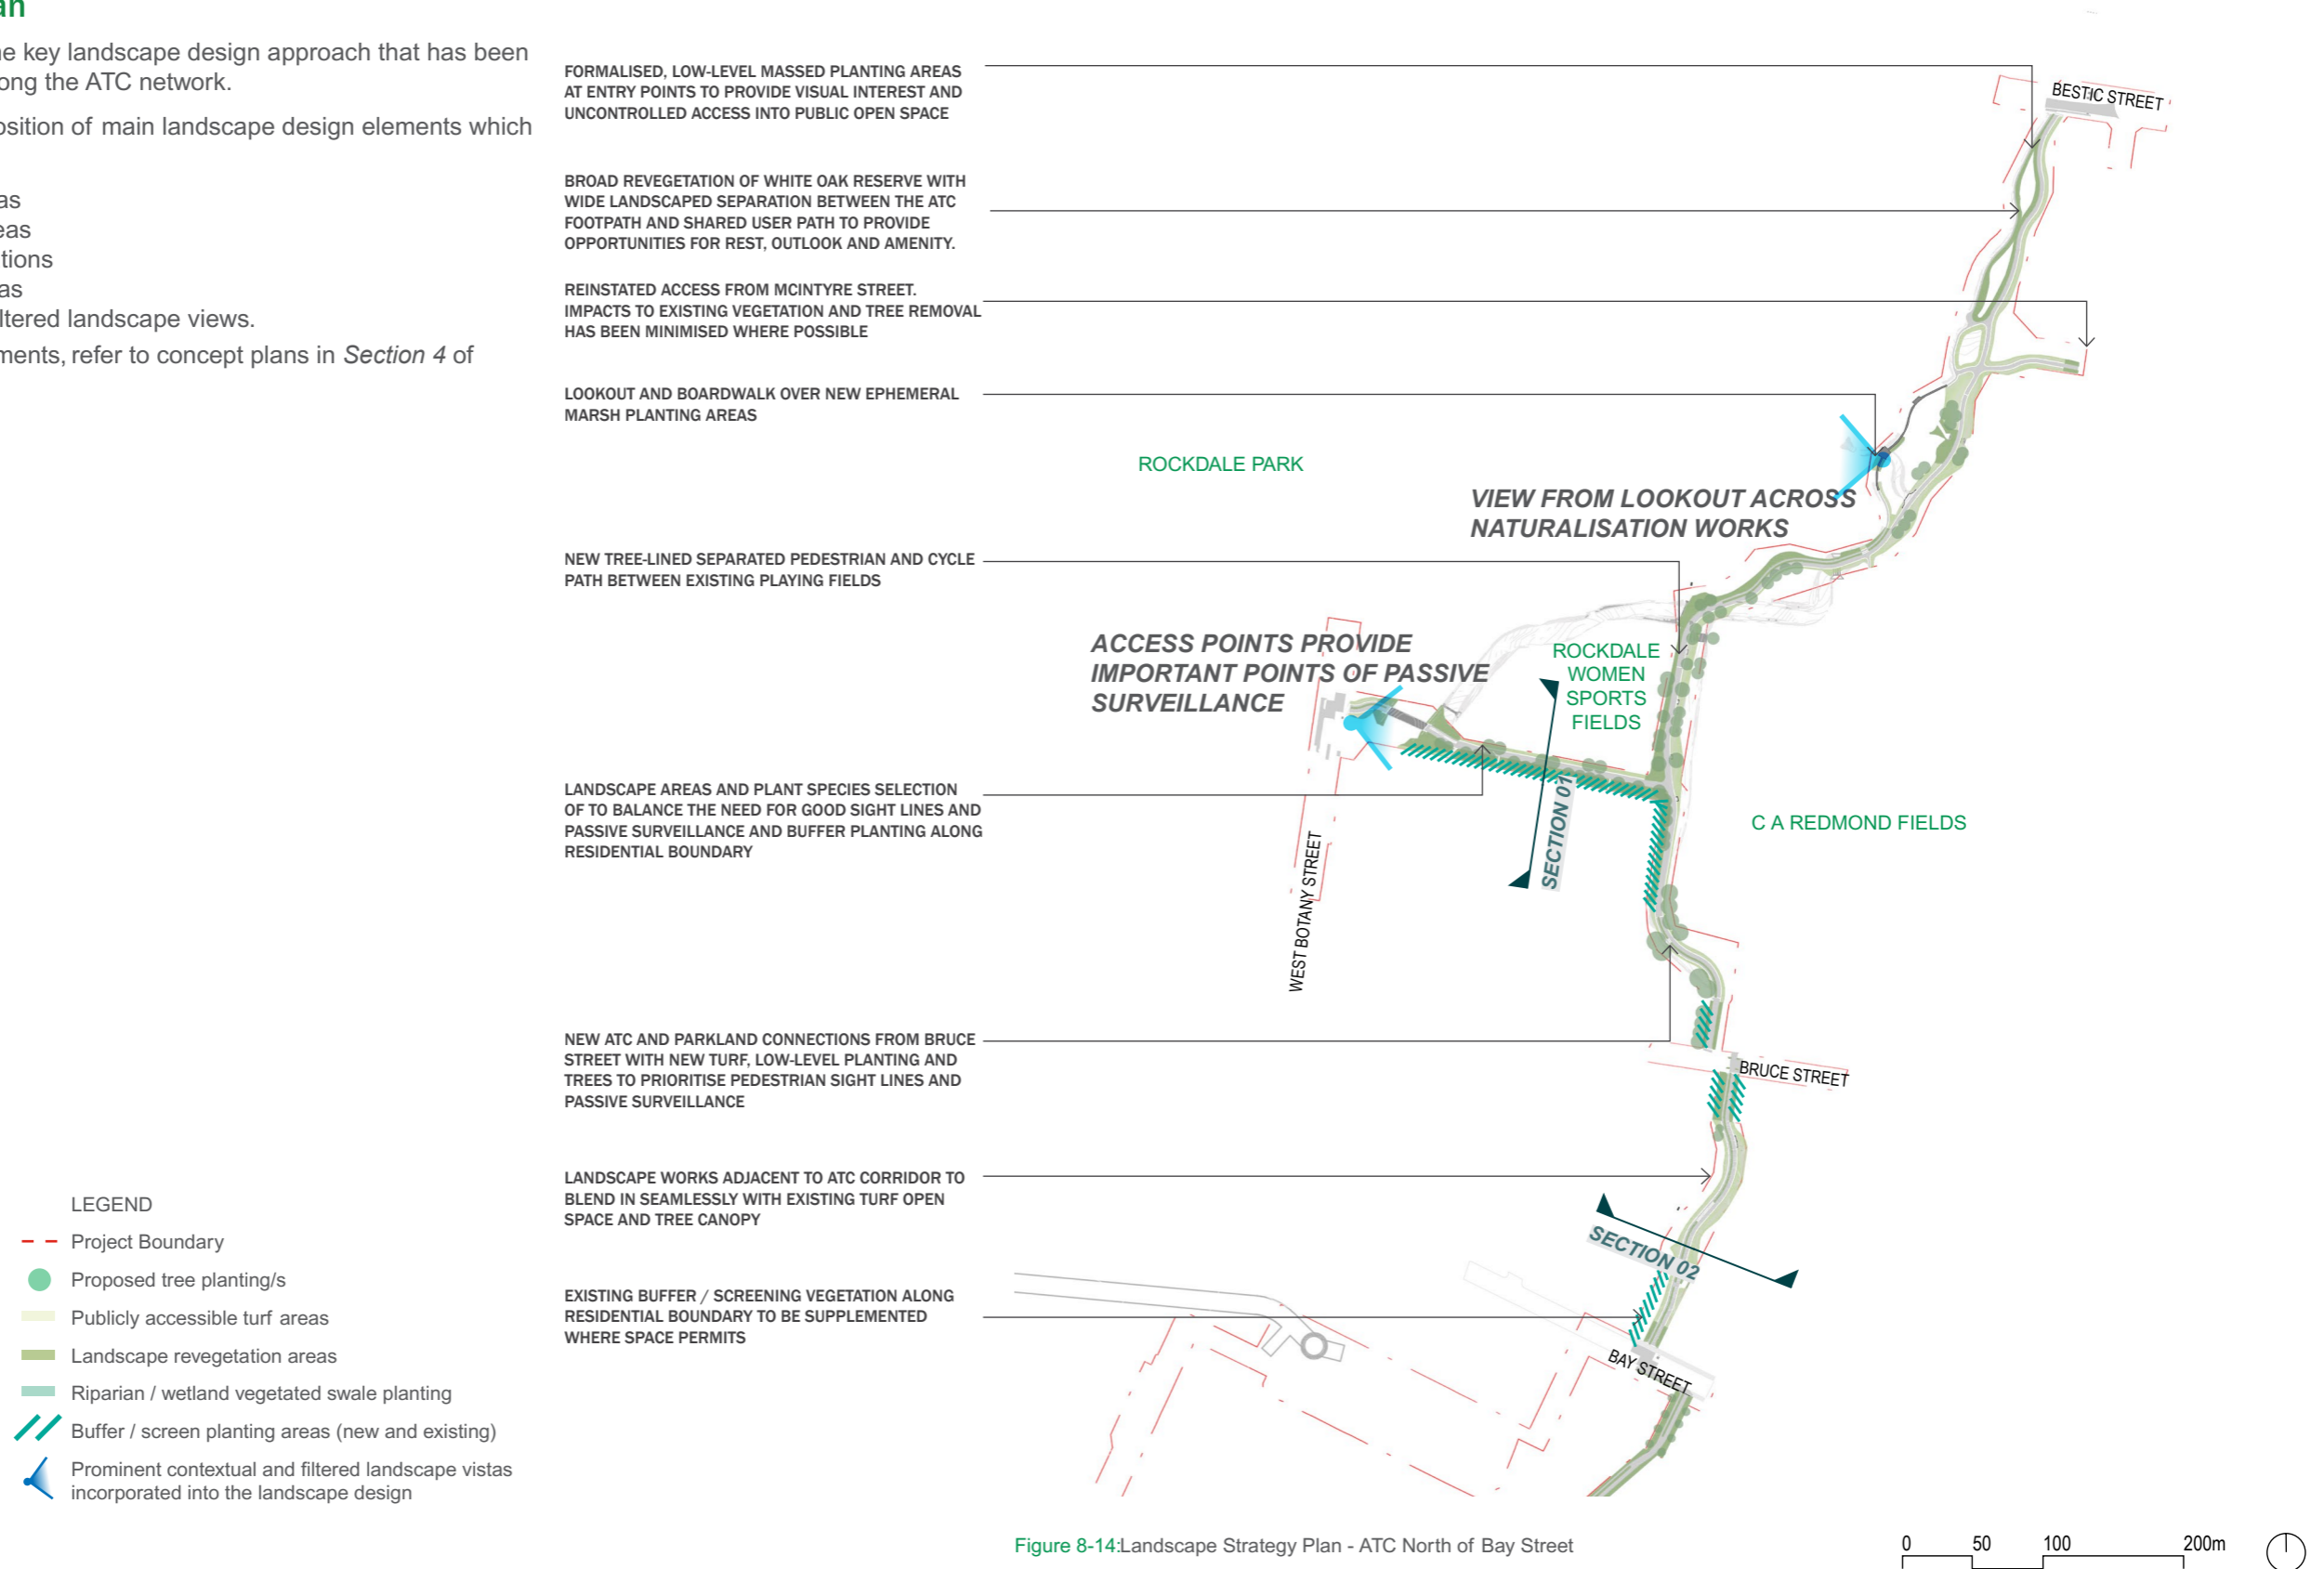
Landscape Strategy Plan - ATC North of Bay Street
